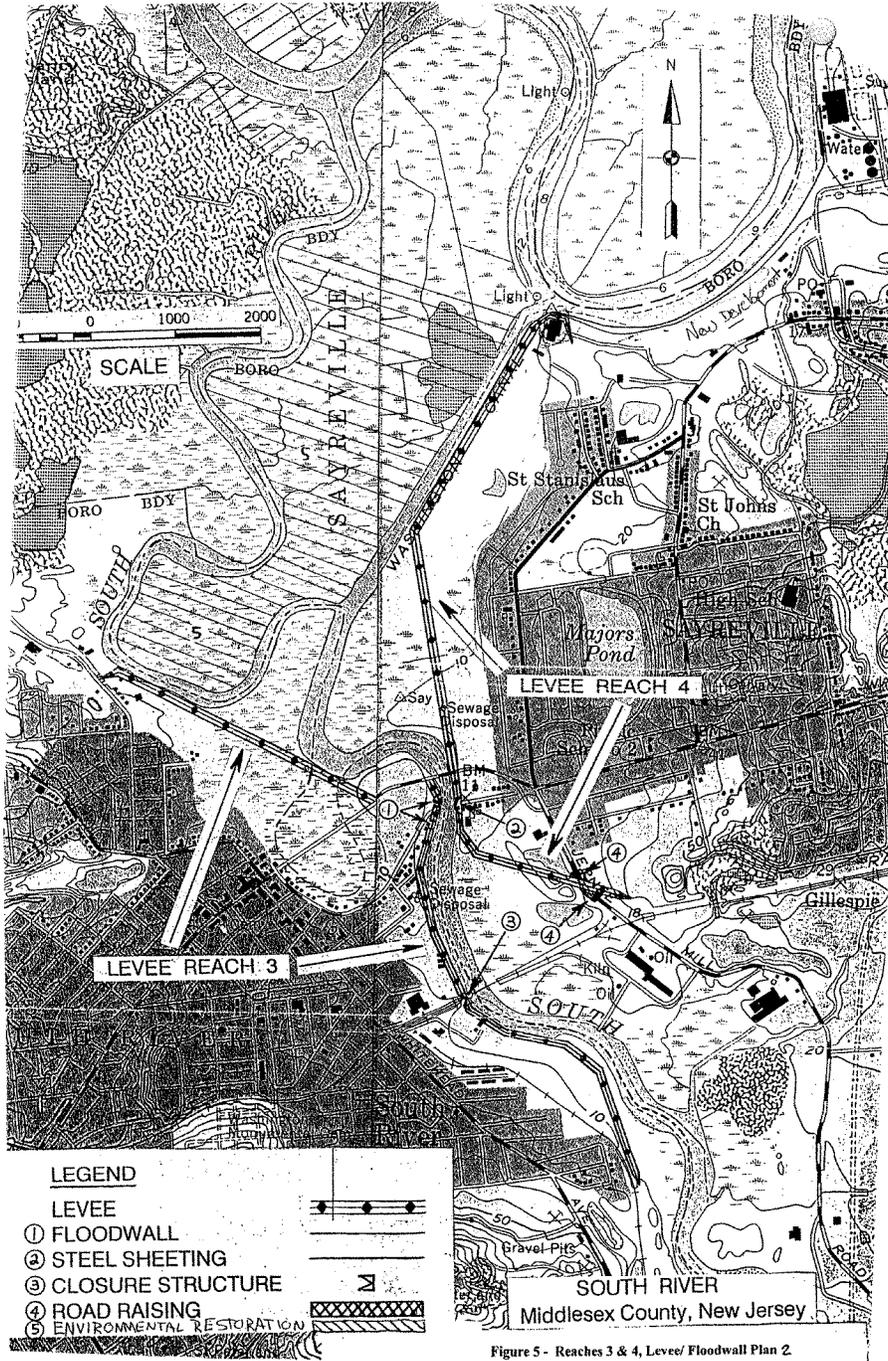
Reaches 3 & 4, Levee/ Floodwall Plan 2
